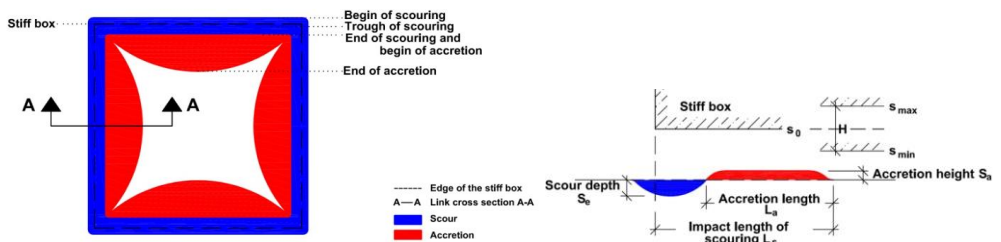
Principle sketch of gravel displacement with a plan view (left) and a cross section (right)
